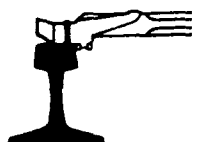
ROAD MASTER'S INSPECTION GAUGE.
